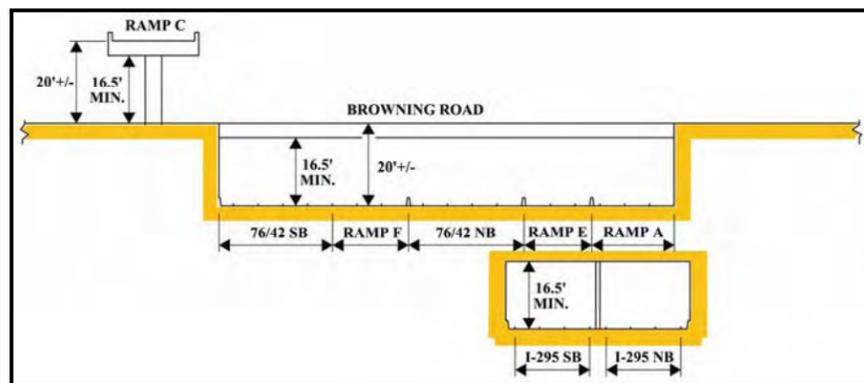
Section A-A at Browning Road (Alternative K)
